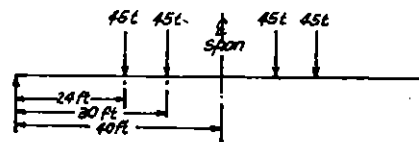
Longitudinal disposition of loading vehicle on beam and slab bridge
